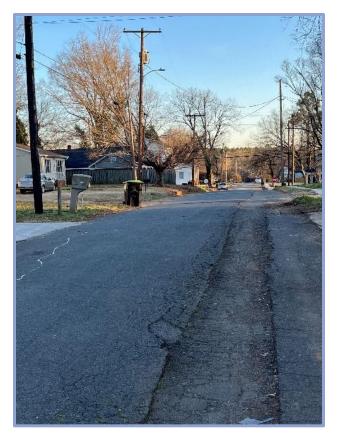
Damaged Infrastructure on Long Street Highlights Vulnerabilities
